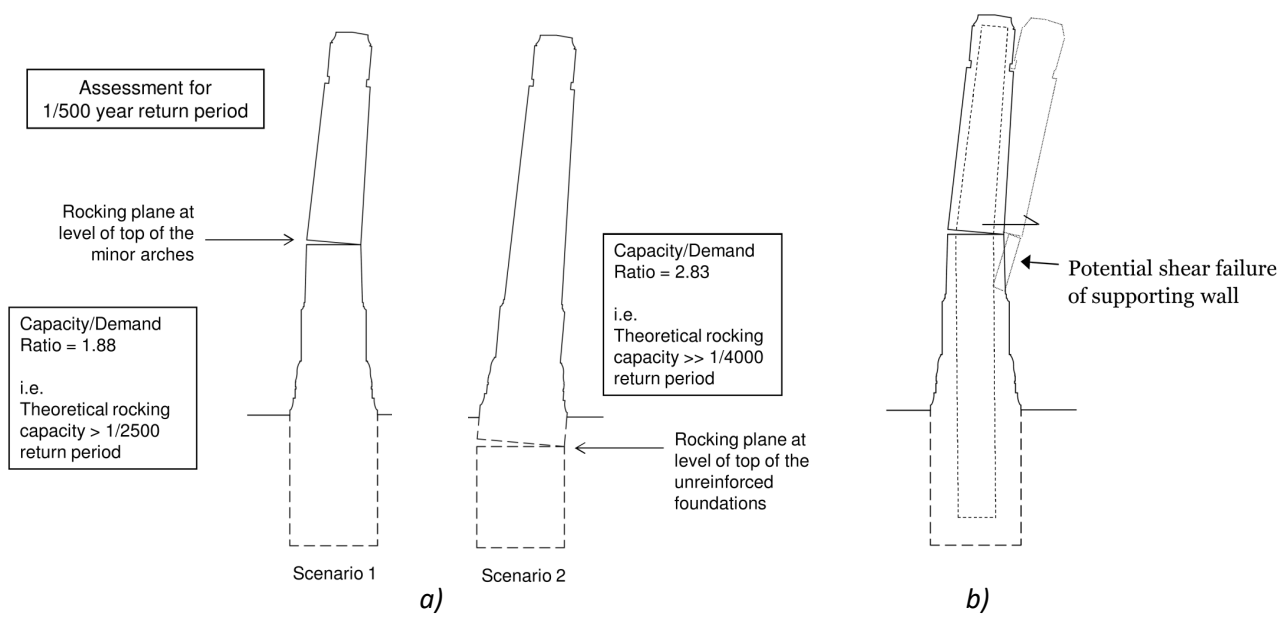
a) Rocking scenario's considered in the assessment; b) Potential brittle failure mechanism during rocking
